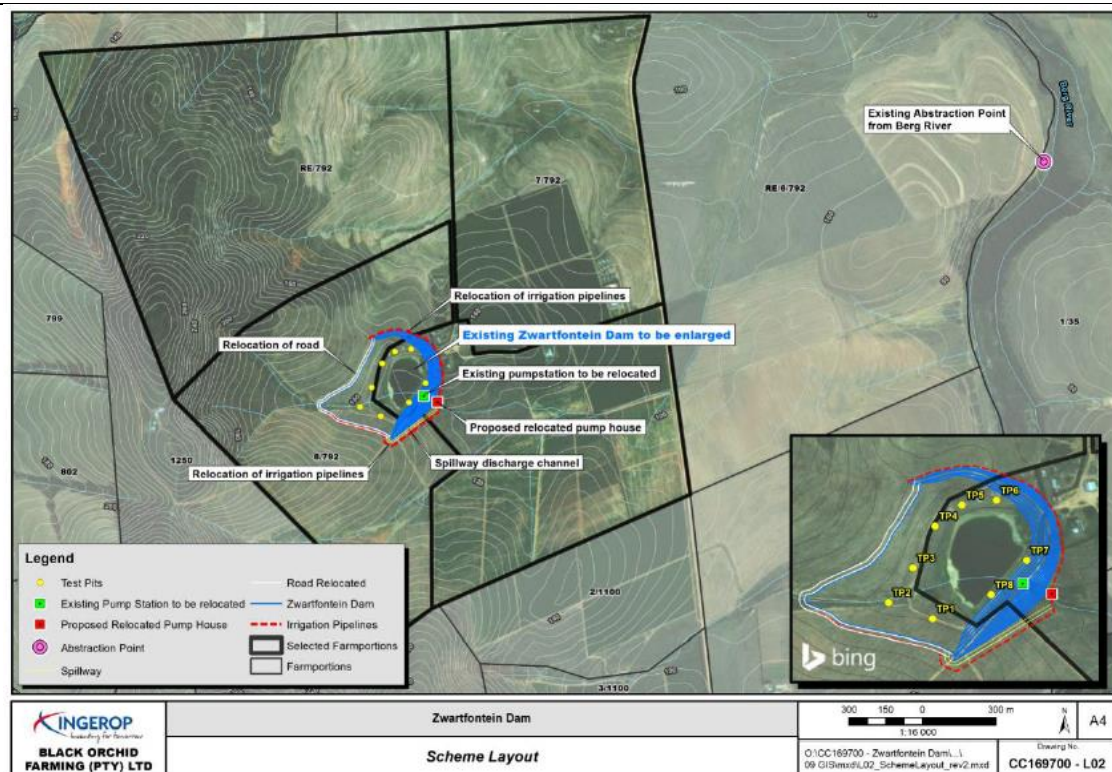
Site plan, Engineers Technical Report indicating the proposed and preferred relocation of dam infrastructure, Ingerop, 2019
